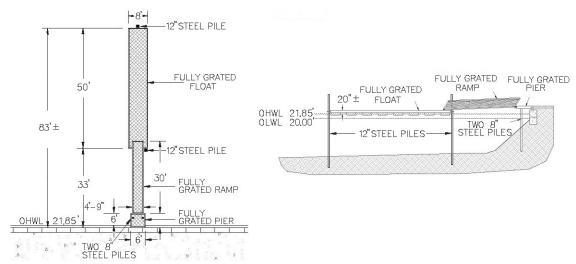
Plan and profile drawings of the SECO Southport western mooring float. (Adapted from SECO 2019c, Pages 3 and 4 of 5).
